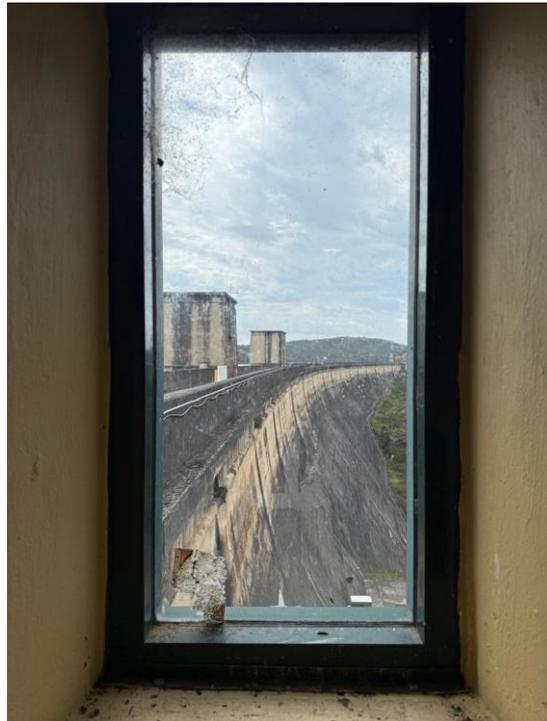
Timber framed opening looking south towards the dam wall and upper valve houses
